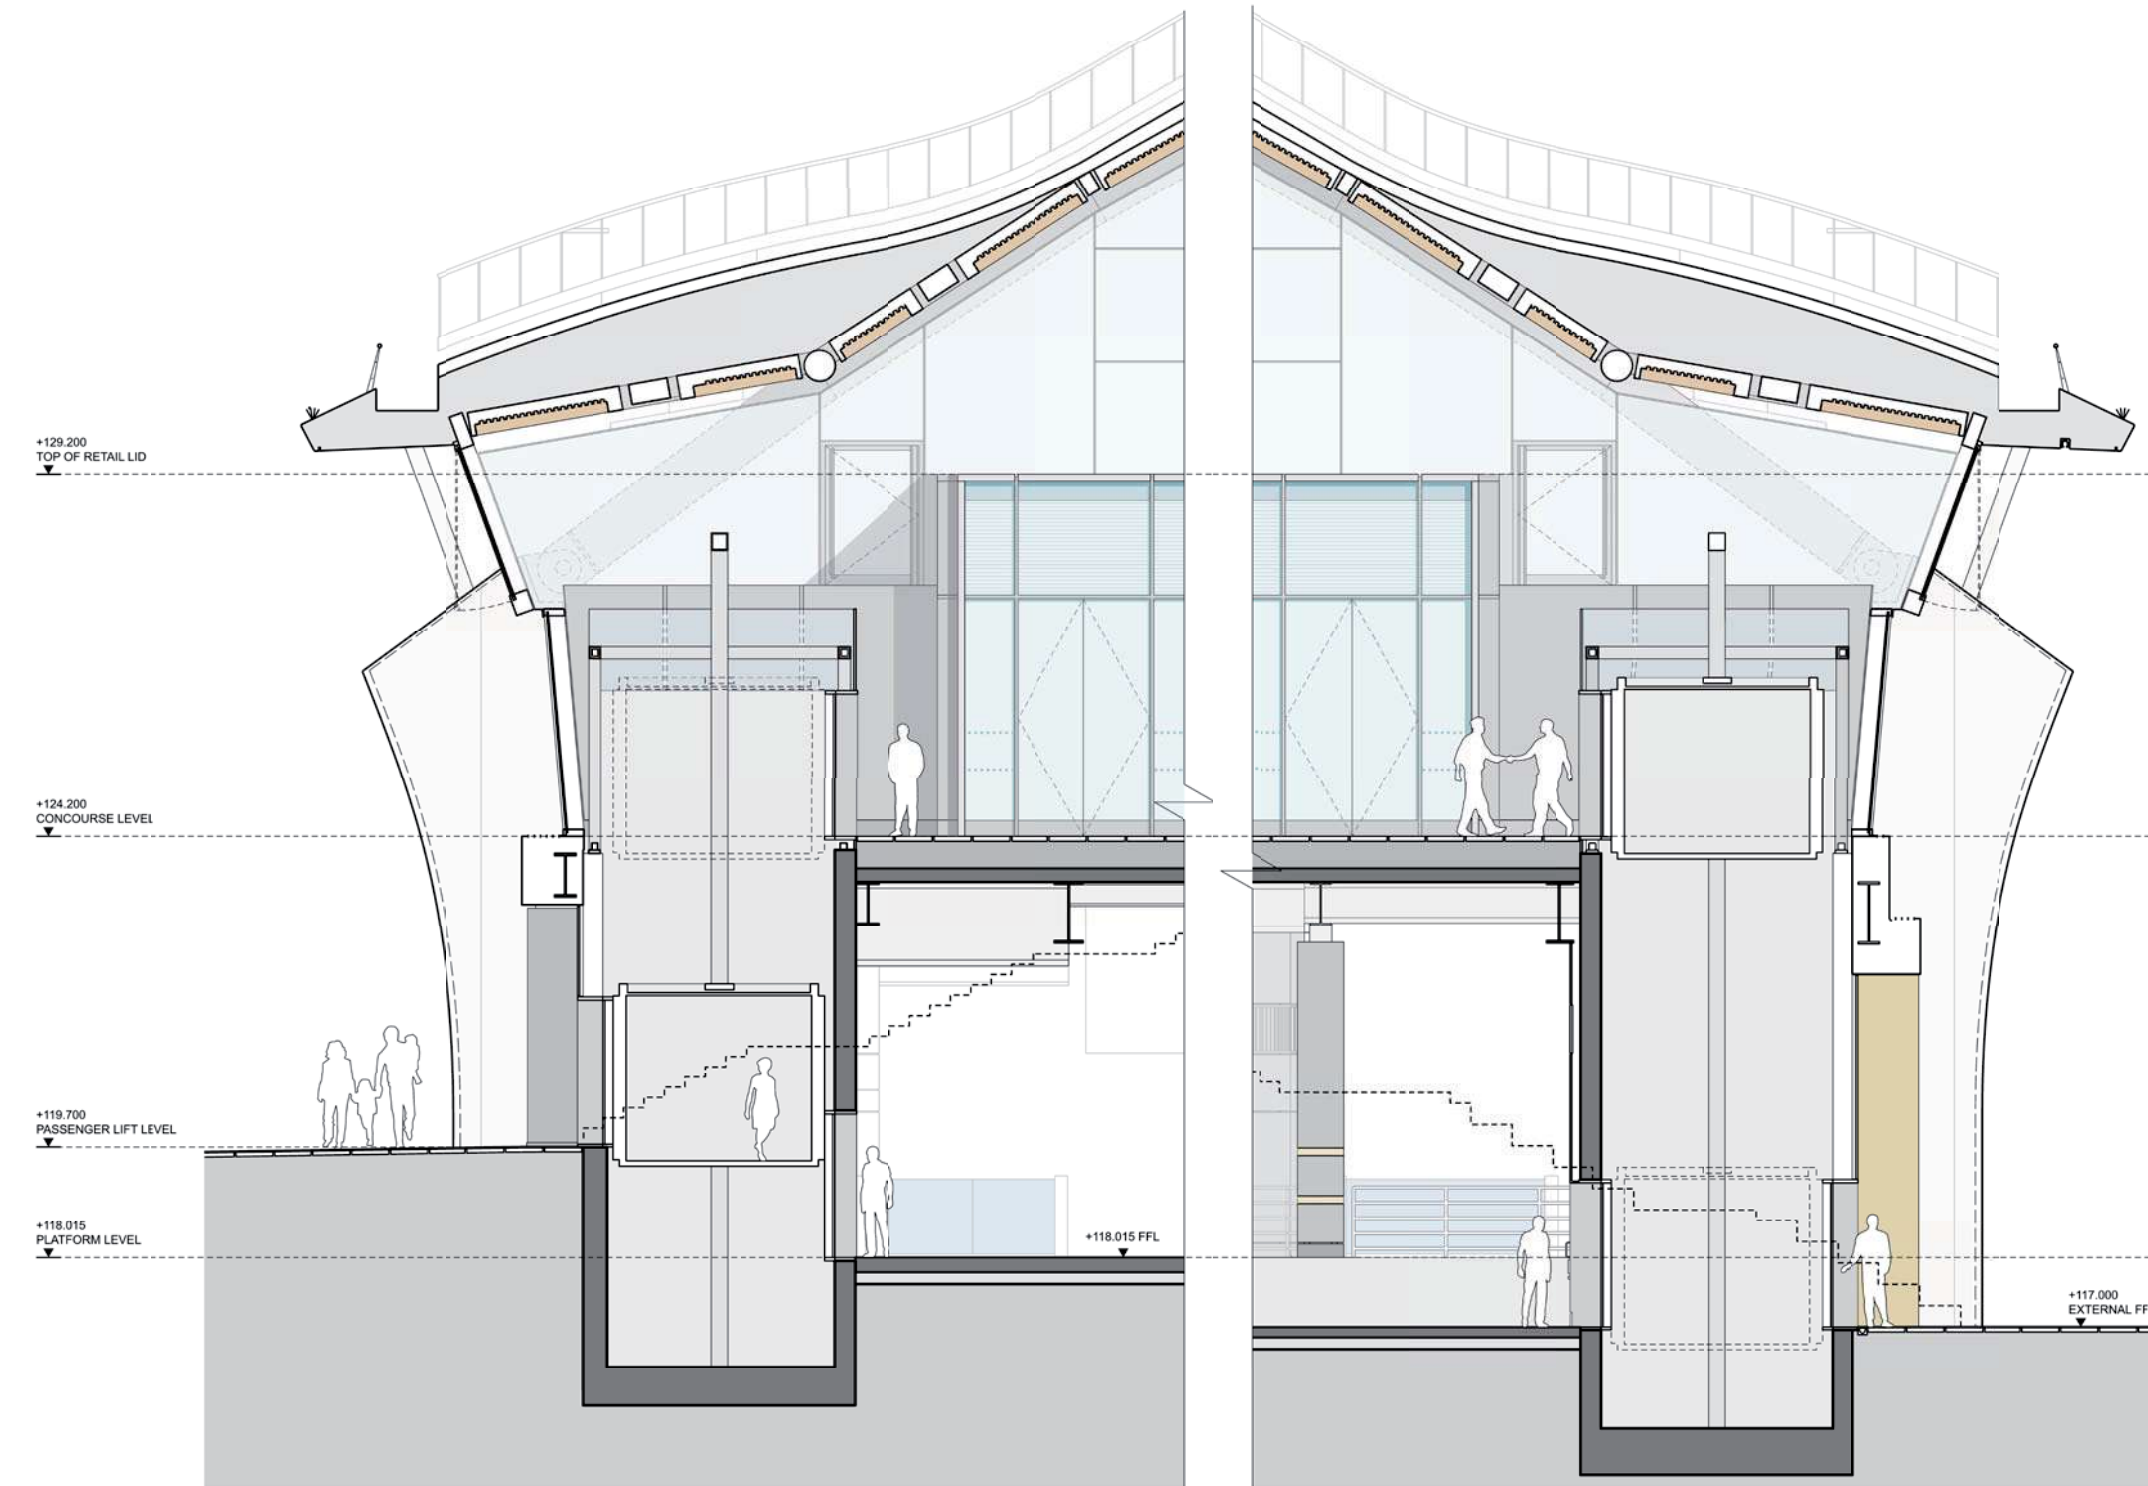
Detail sections of public realm lifts on North (left) and South (right)
